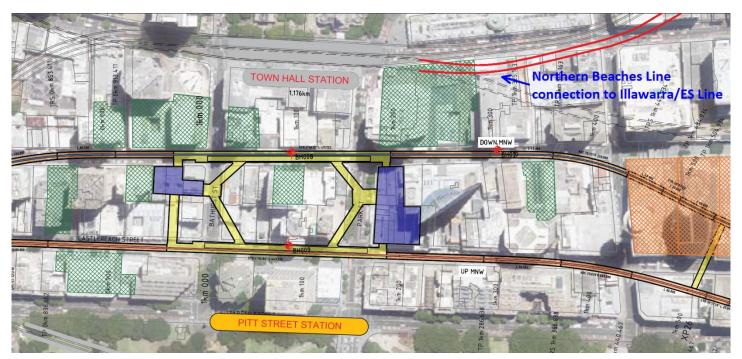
Proposed Northern Beaches line connection (red) to Illawarra/ES line at Town Hall superimposed on Sydney Metro EIS geological plan of Pitt St/Town Hall stations
